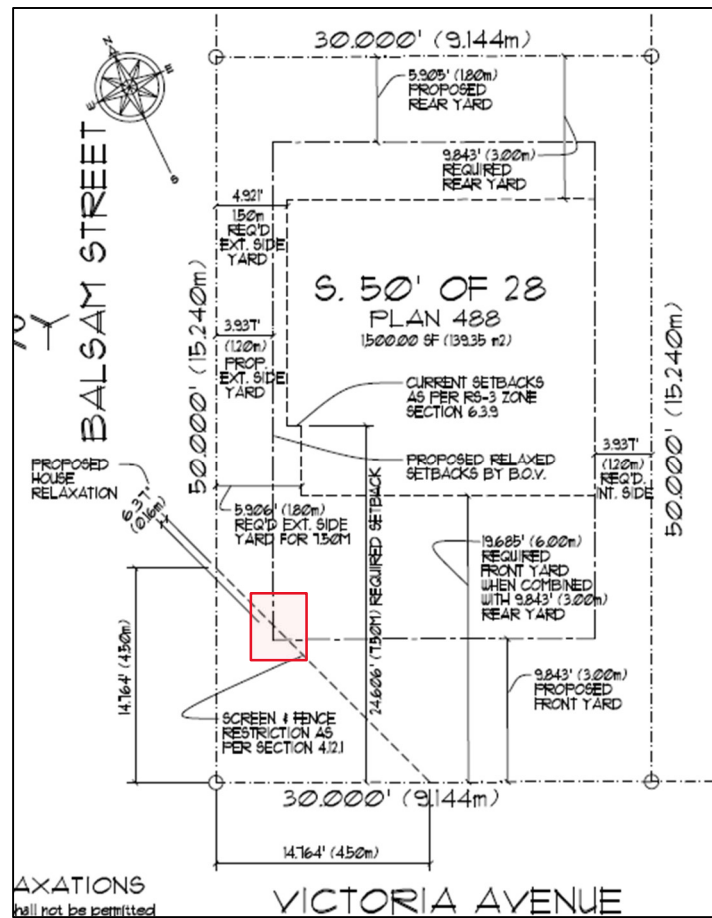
Southwest corner wall encroachment (red) into the required exterior lot corner clear area
